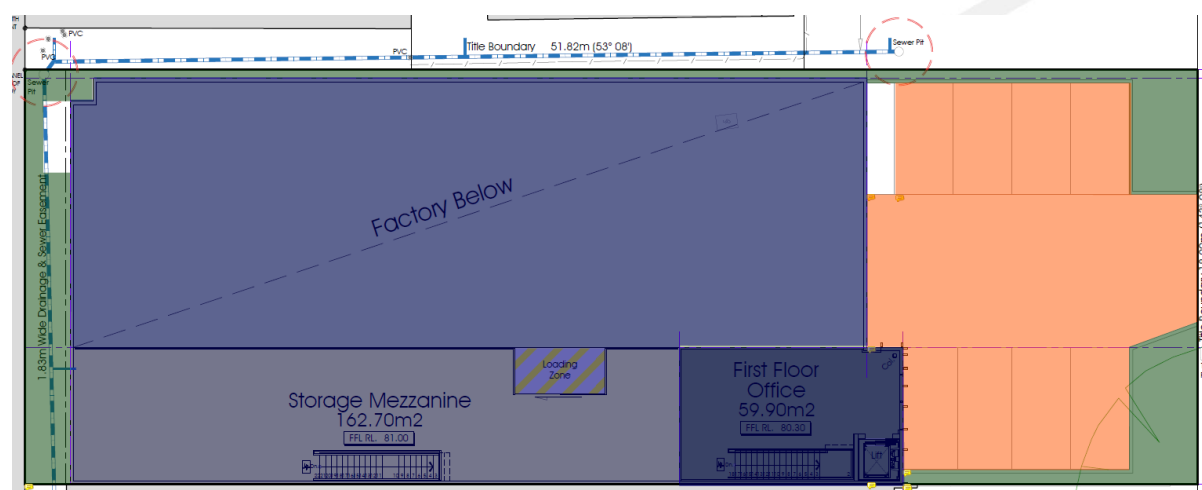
Entire roof catchment area is to be diverted into RWTs (light and dark blue), permeable areas (Green), driveway diverted (orange) into Envis pits and impervious areas (Uncoloured-driveway and exterior stairs)
